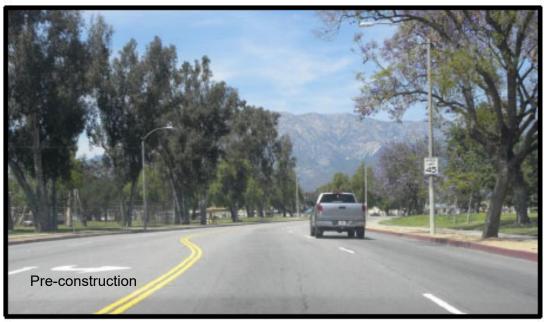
Viewpoint #1, Looking North along Grove Avenue near East I Street
